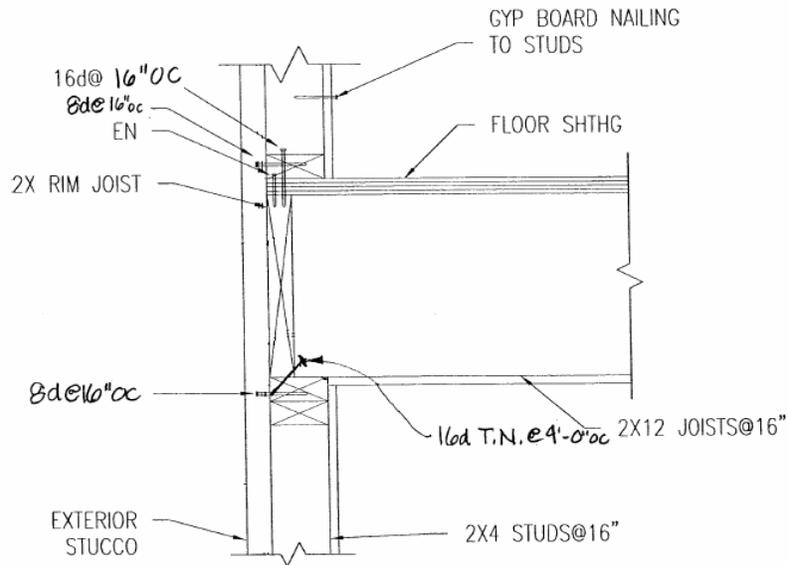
Index building 4 floor edge joists perpendicular (detail 4-S2)
